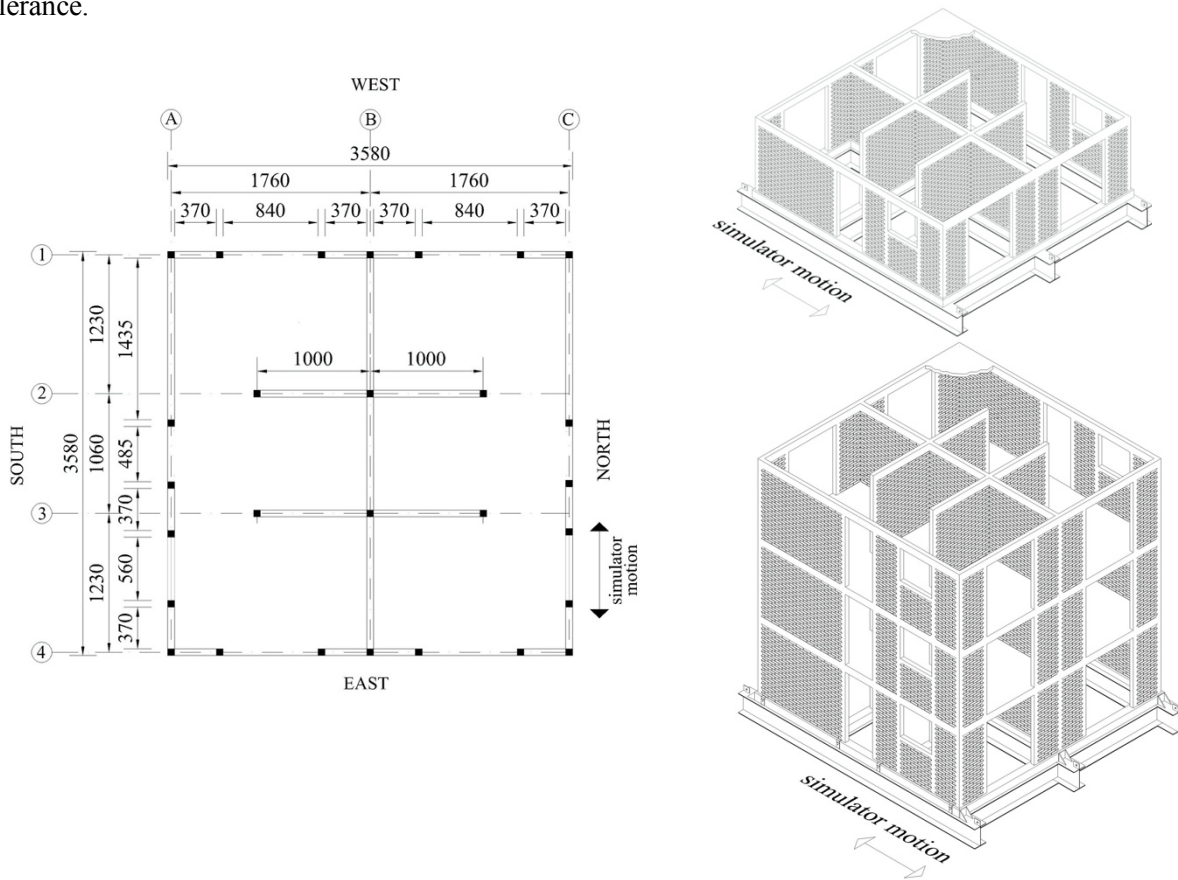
Model plan and 3D views of specimens M1 and M3 (units in mm)
